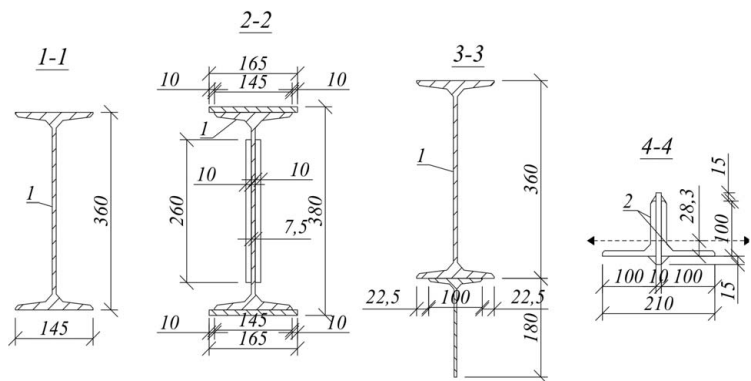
Drawing of the metal truss structure with characteristic cross sections: 1 – H-beam No. 36, 2 – steel angles 100×10
